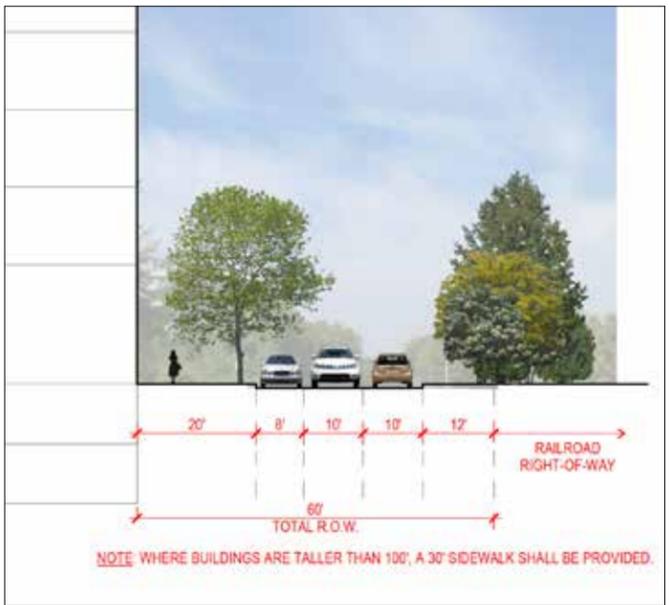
Cross section through typical "P" street with railway frontage
